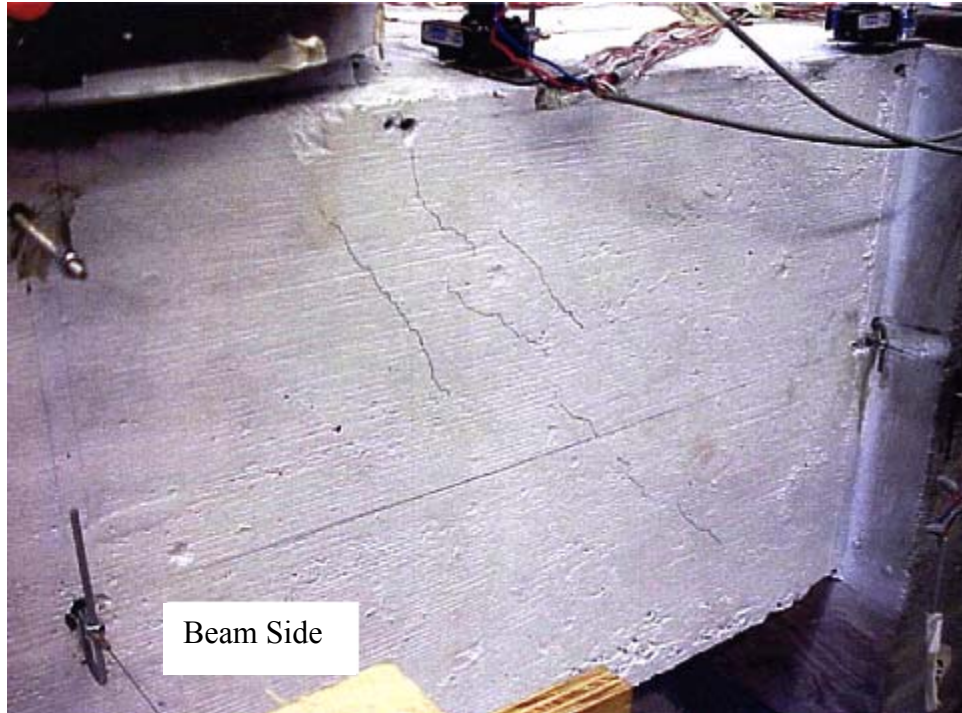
Early Torsional Cracking in the Outrigger Beam of Specimen ASO
